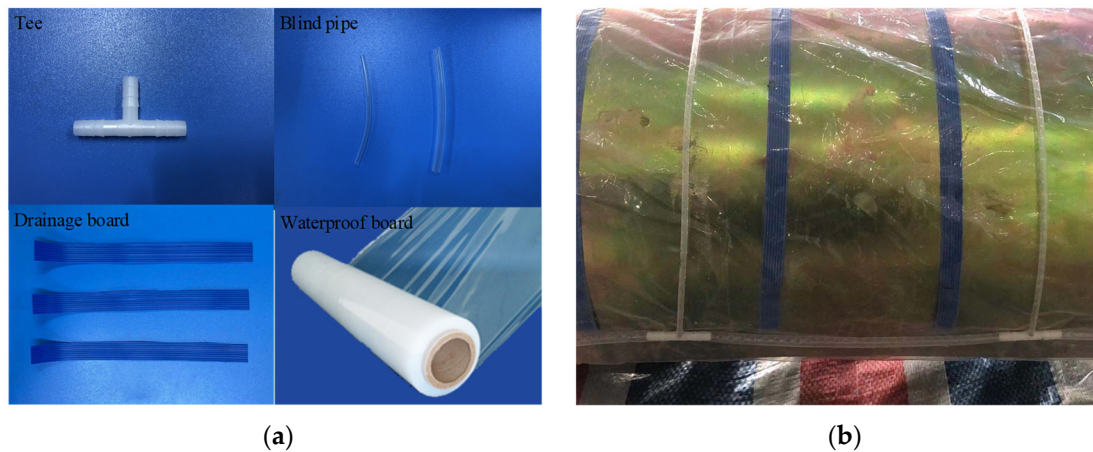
Components of drainage system. (a) drainage board; (b) assembly.
